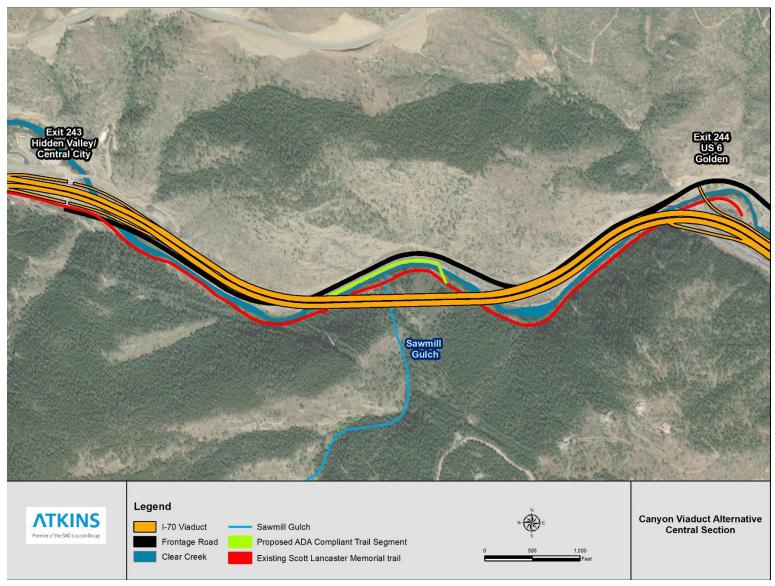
Section 4(f) Resources and Elements of the Canyon Viaduct Alternative–Central Section
